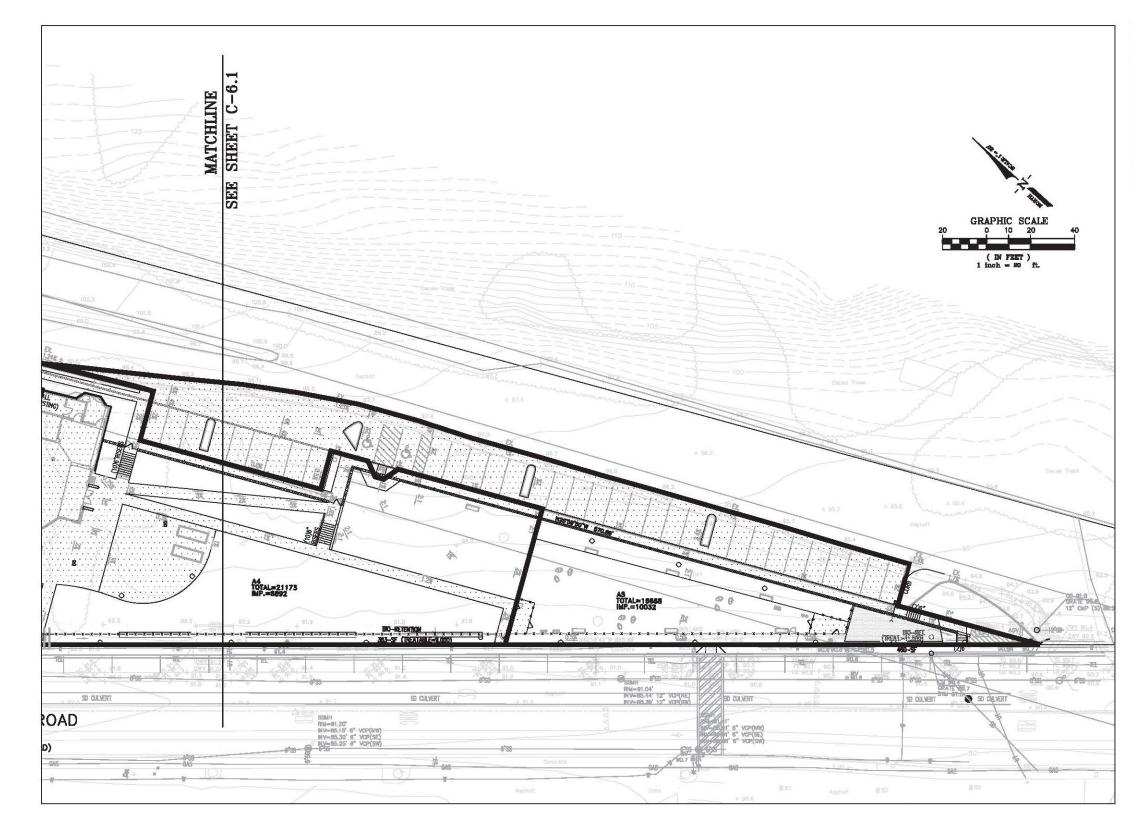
Storm Water Treatment Plan (Page 1 of 2)
